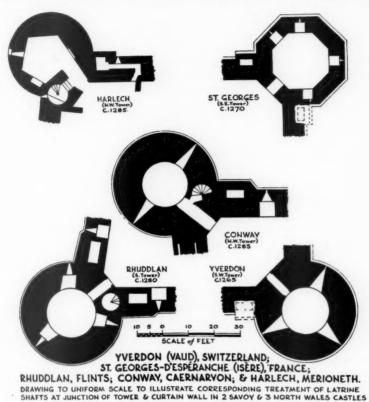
Plans showing junction of towers, curtains, and latrine shafts at St. Georges, Yverdon, and three north Wales castles.
